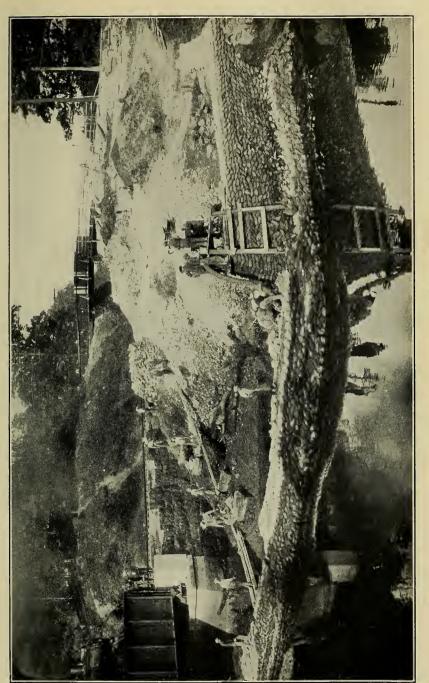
PLATE XIV—BUILDING SAND BAG COFFER-DAM FOR CONSTRUCTION OF EASTERLY ABUTMENT, NEPONSET RIVER BRIDGE.
